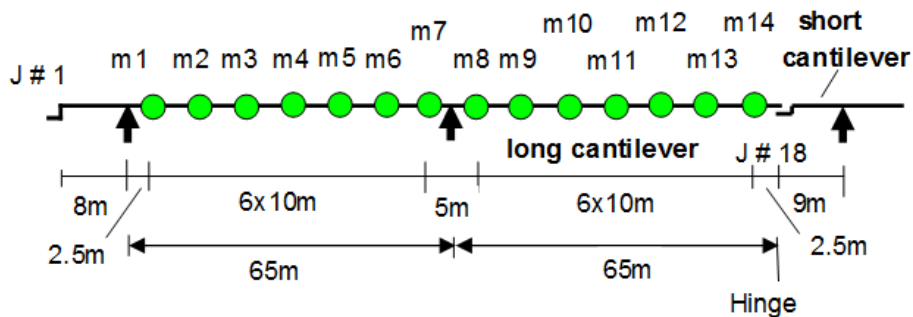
Bridge frame Case “1” with no mass at J#1
